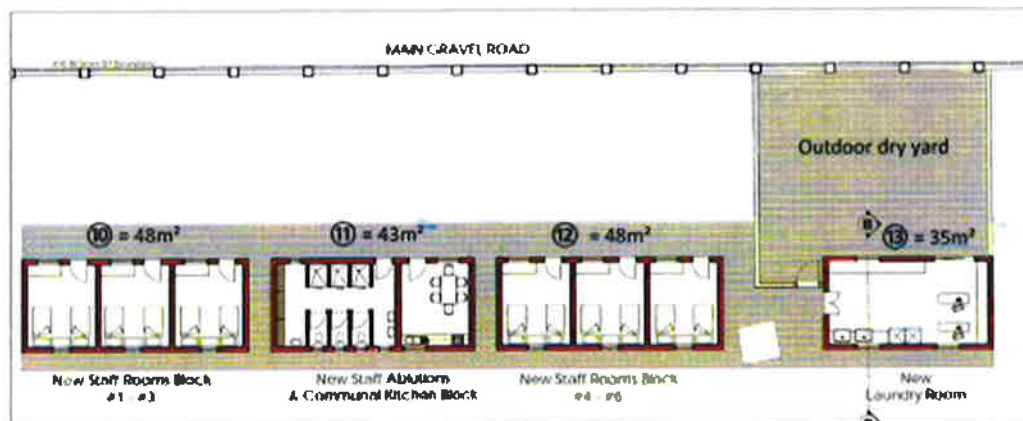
Proposed staff rooms, communal ablution and kitchen block, and laundry room. (Credit: Konsep Architectural Design Consulting Studio).
